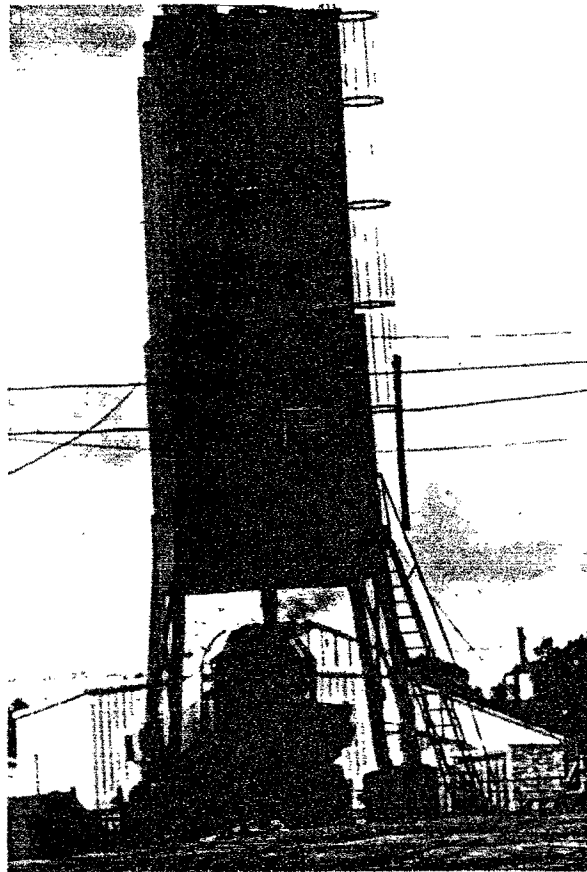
Fly Ash Silo Used on Scott Street in Houston, Texas (Test Site No. 10)
